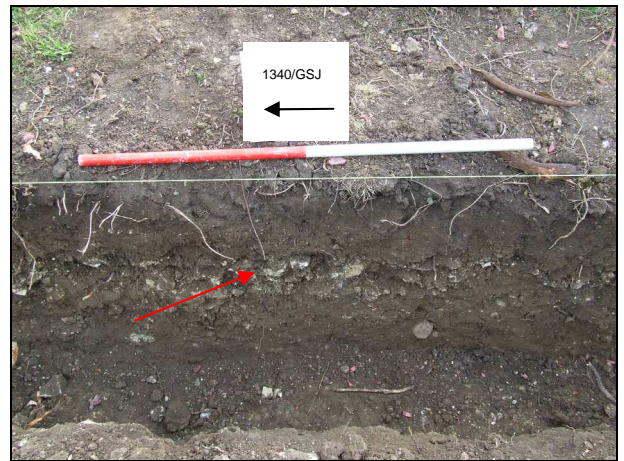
Limestone surface at northern end of footing trench, looking E (scale 1m)
